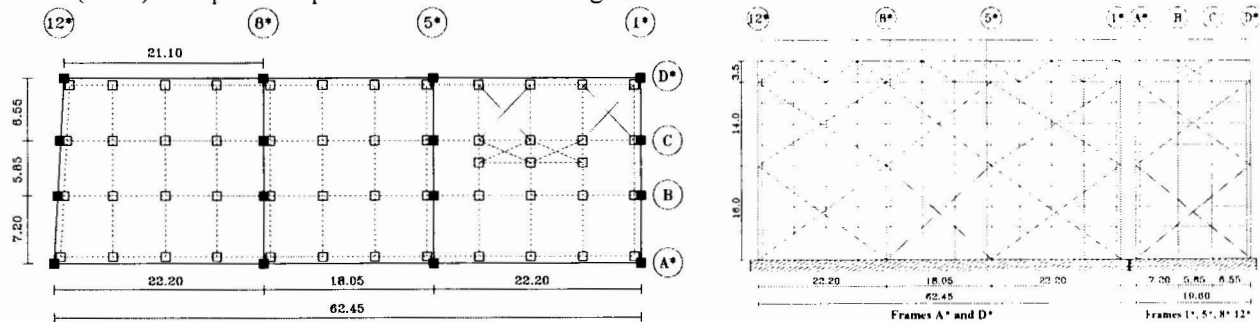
Plan and elevation for AE2 building (dimensions in meters)
